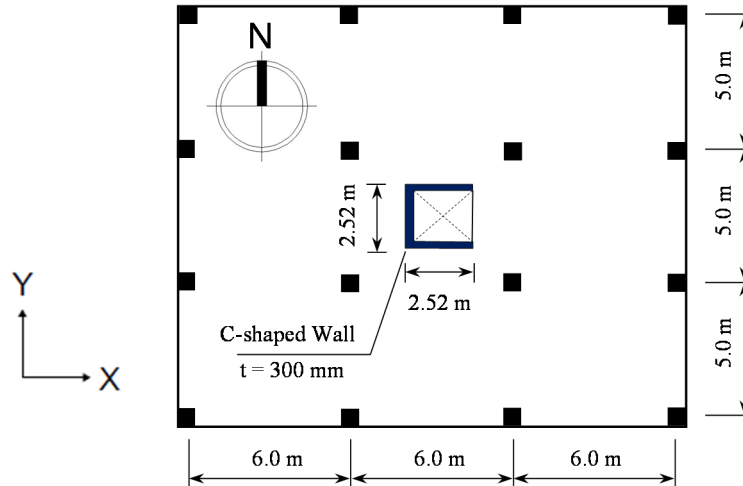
Plan of the building studied using the hybrid test system (Mechmachi and Bouaanani, 2018)
